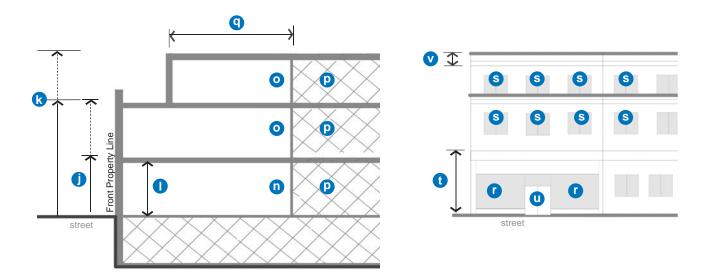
(2). Large Format Building: Height & Use Requirements.
